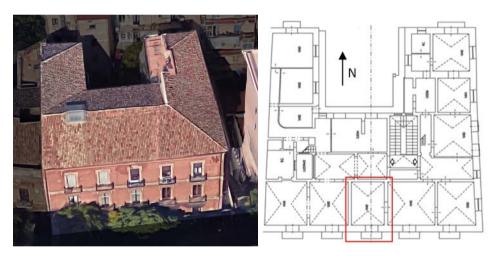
Building selected as a case study: aerial view and plan of the second floor
